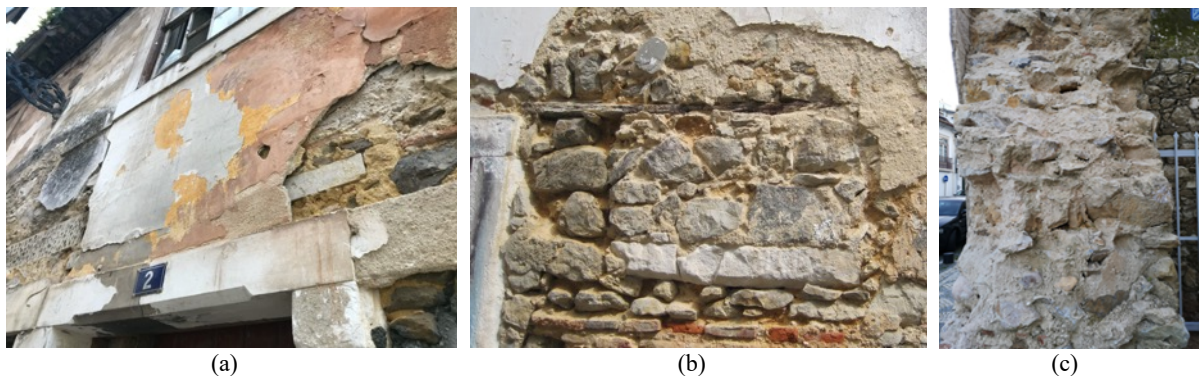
Rubble stone masonry with other material units: sub-horizontal arrangement (a, b) and cross section (c) of some masonry walls in Leiria
